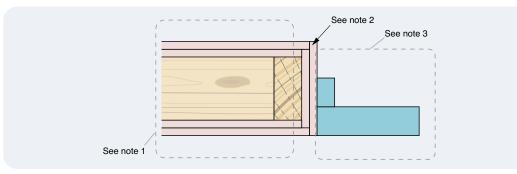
Access panel in a fire-protected timber-framed wall.
